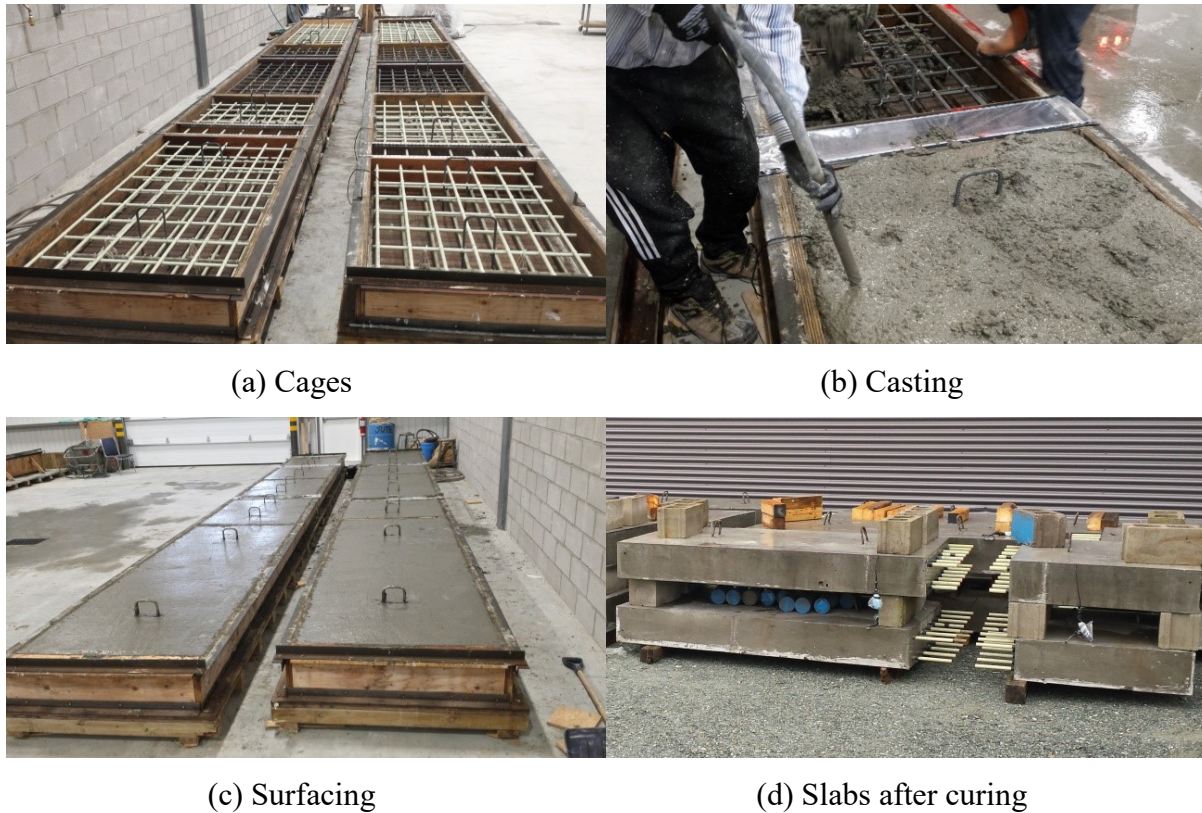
Fabrication of the reference specimen and precast slabs
